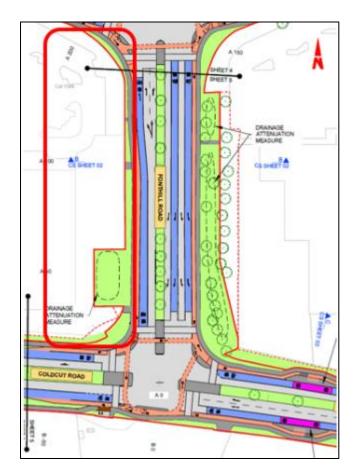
Proposed new Layout at Liffey Valley Retail Park
